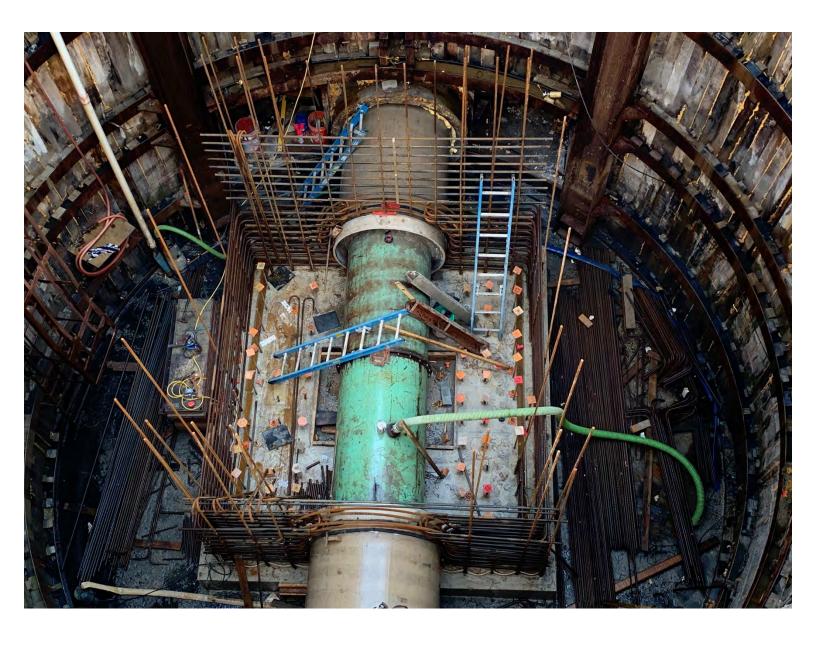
CS-13 Construction – Wall Lift #1 Rebar Installation
